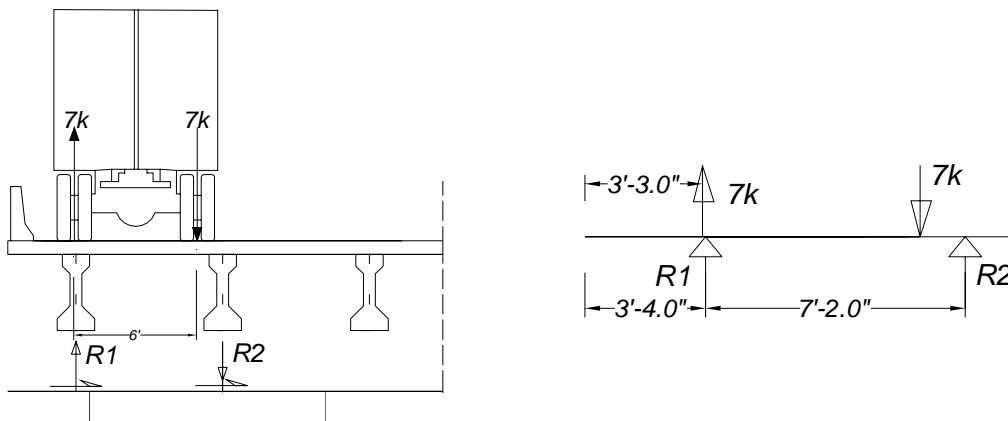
Girder reactions on pile cap due to wind load on Live load
